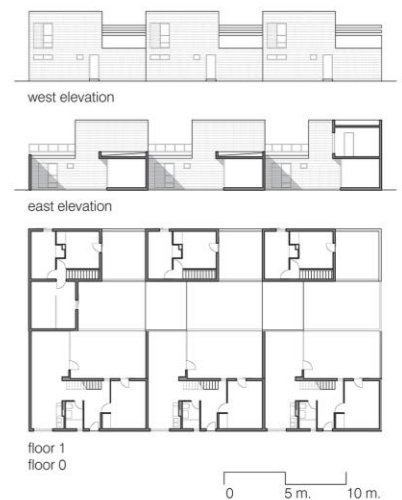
Caño Roto Housing Estate. Plans and elevations of the building typologies according to the original project. (Source: Drawing by the author).
